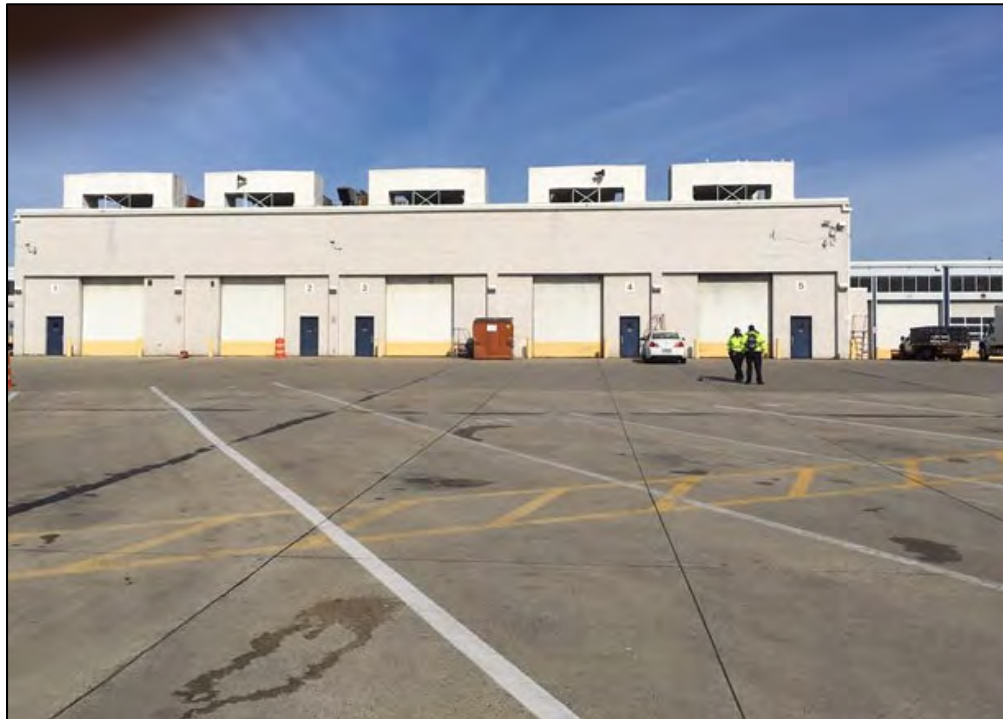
Building 1 East Elevation Paint Room Addition, facing West
